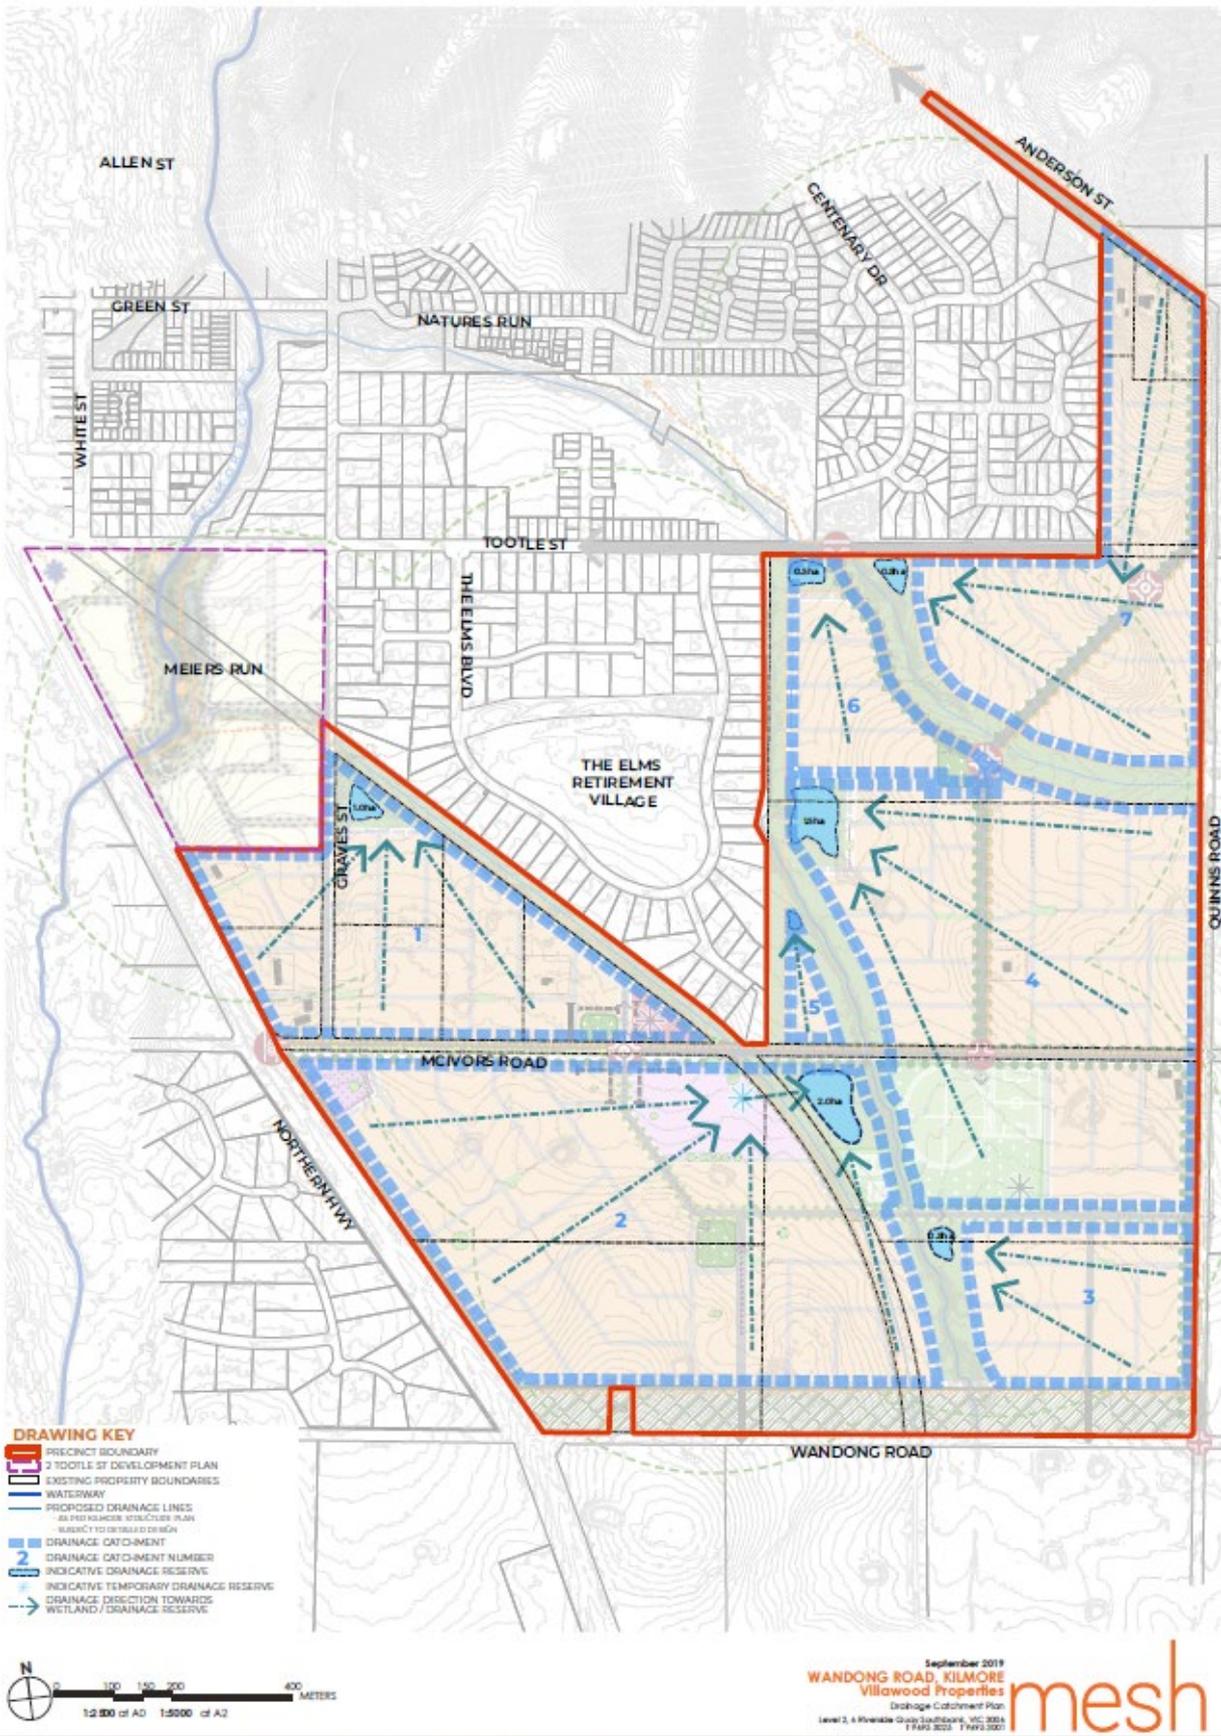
Original Development Plan – Note: Stormwater areas updated since Afflux 2019.
